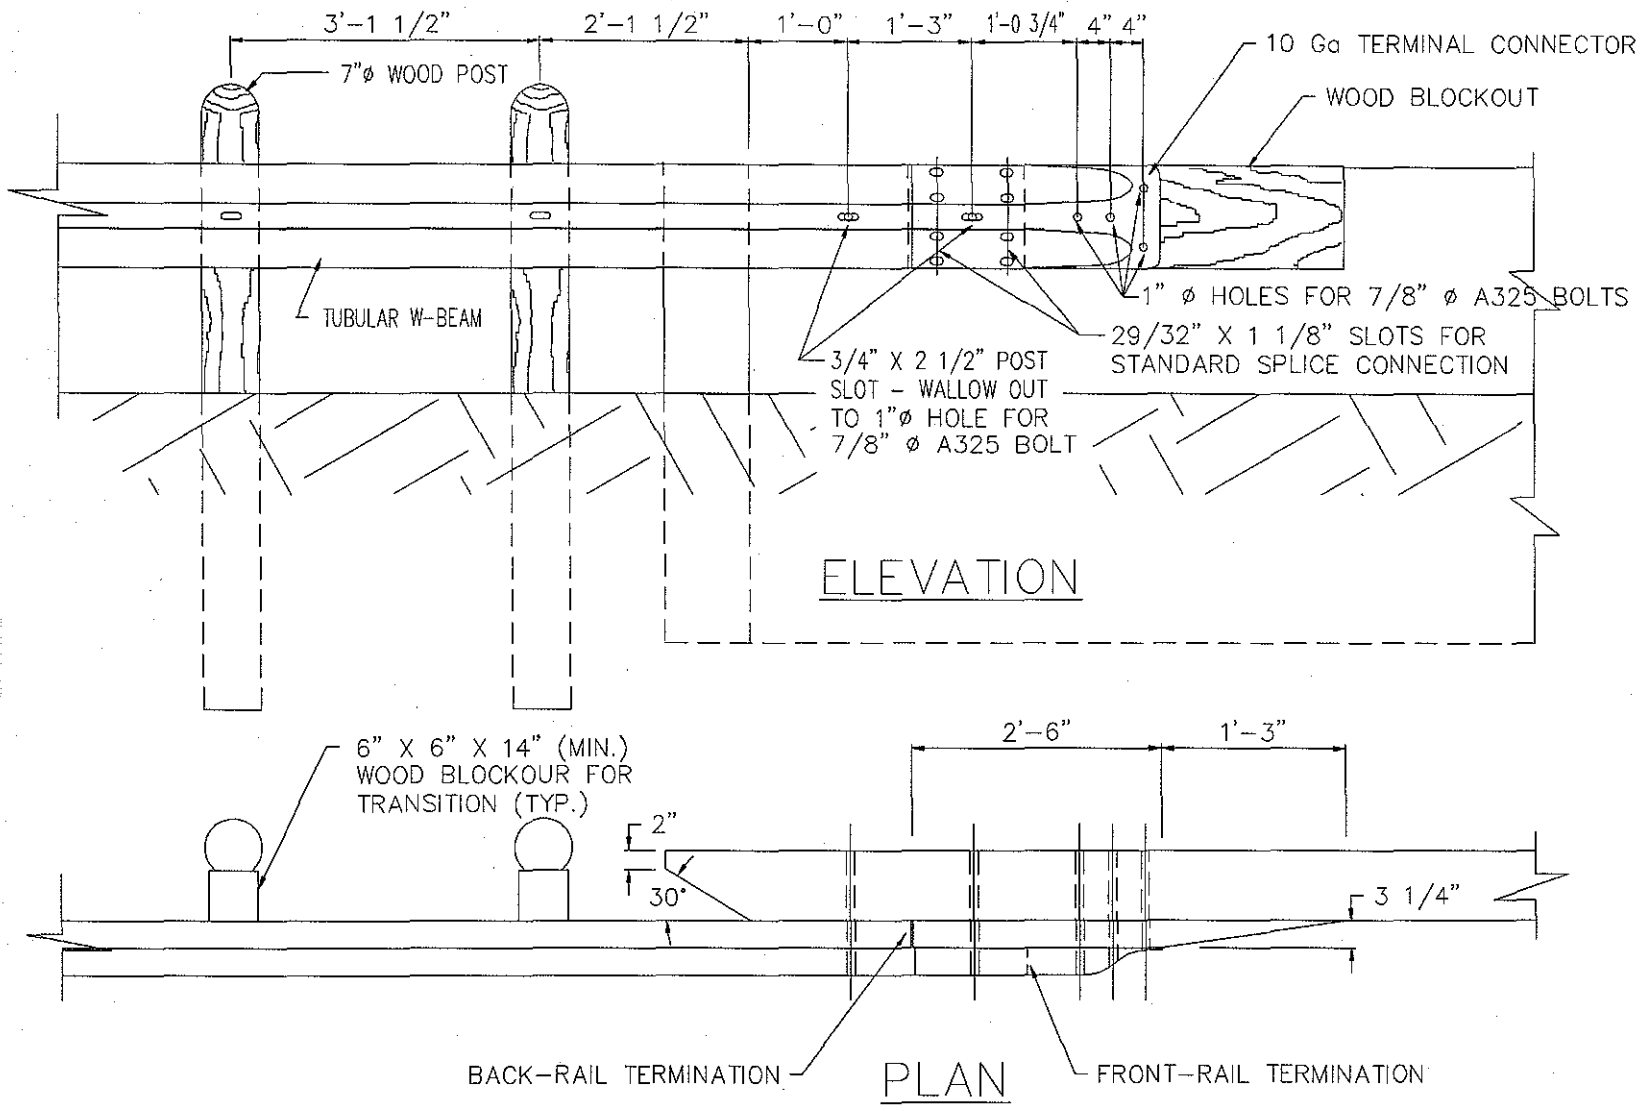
TUBULAR W-BEAM CONNECTION TO VERTICAL WALL FOR NEW CONSTRUCTION INSTALLATIONS
